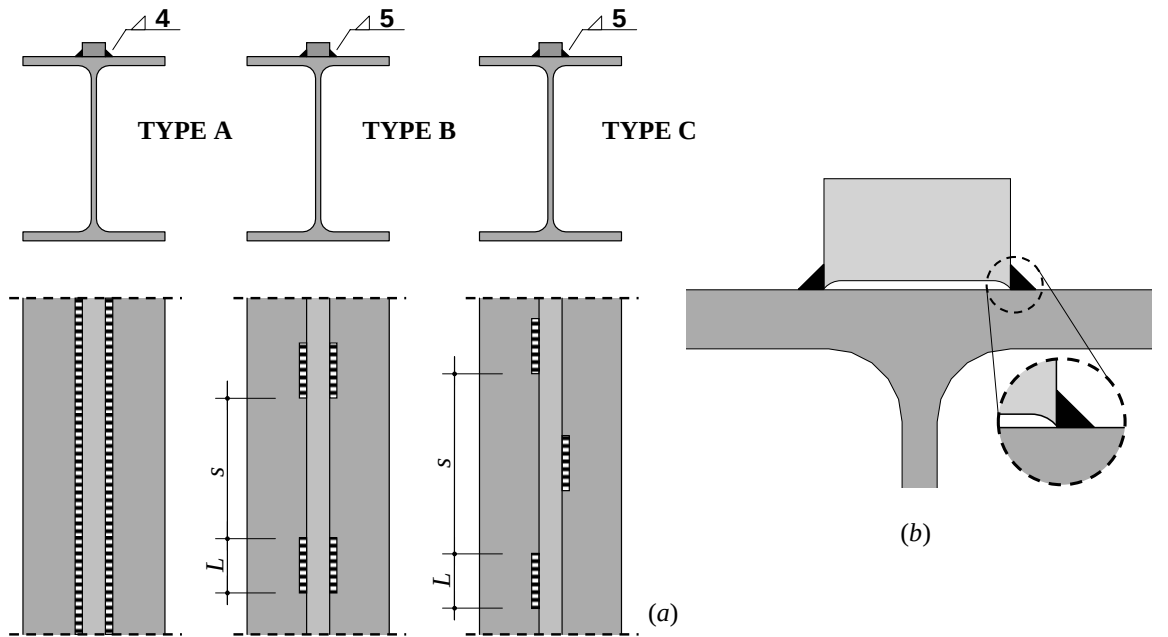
(a) Tested types of rail welds, (b) recessed rail bottom
